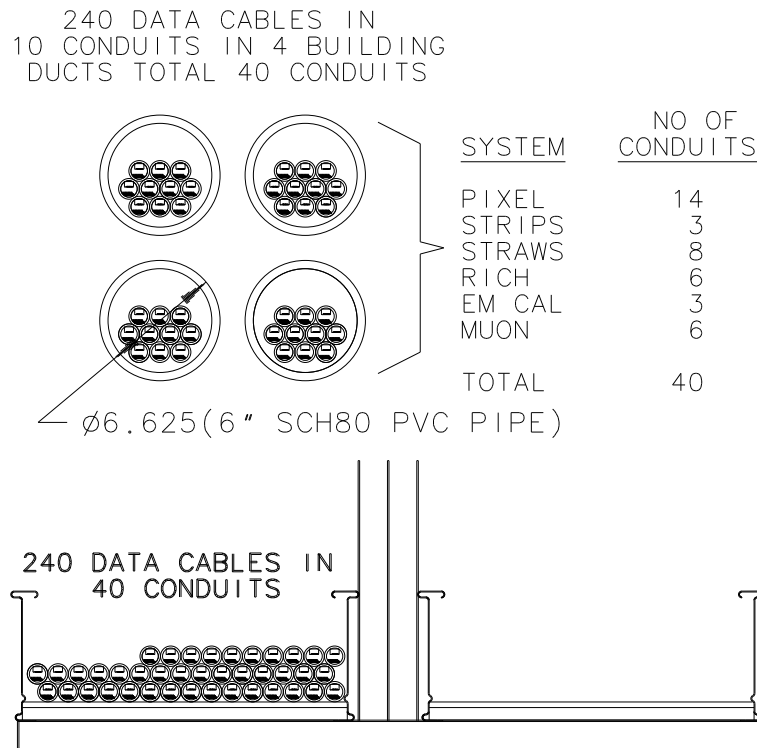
Layout of DAQ fibers in the collision hall wall penetrations and cable trays.
